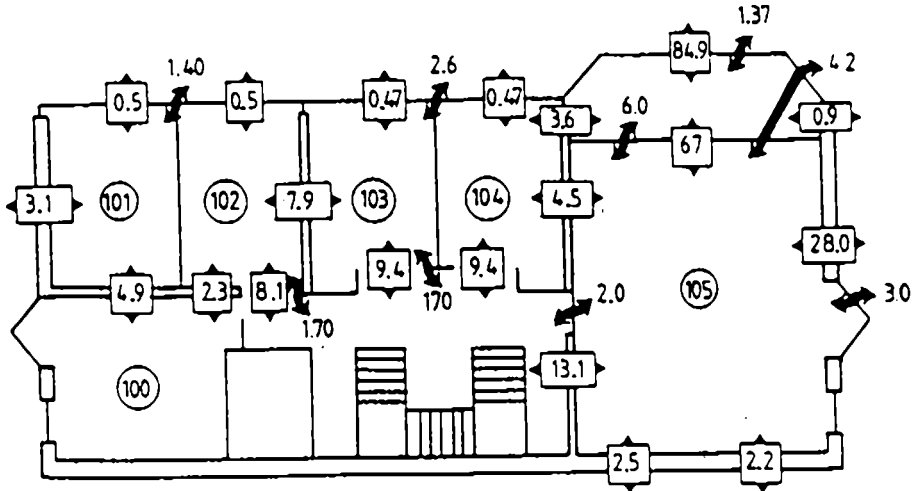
Thermal conductances in [W/K] between rooms and also with outside. Second floor.
